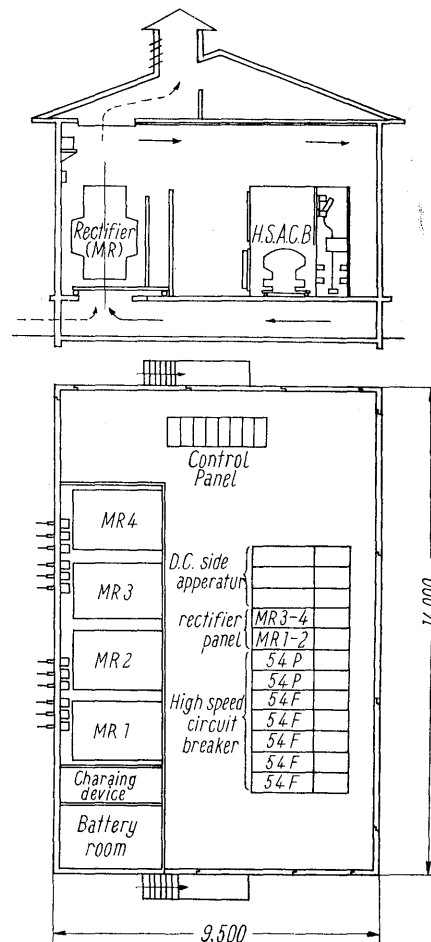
Indoor arrangement of a railway pumpless rectifier substation
